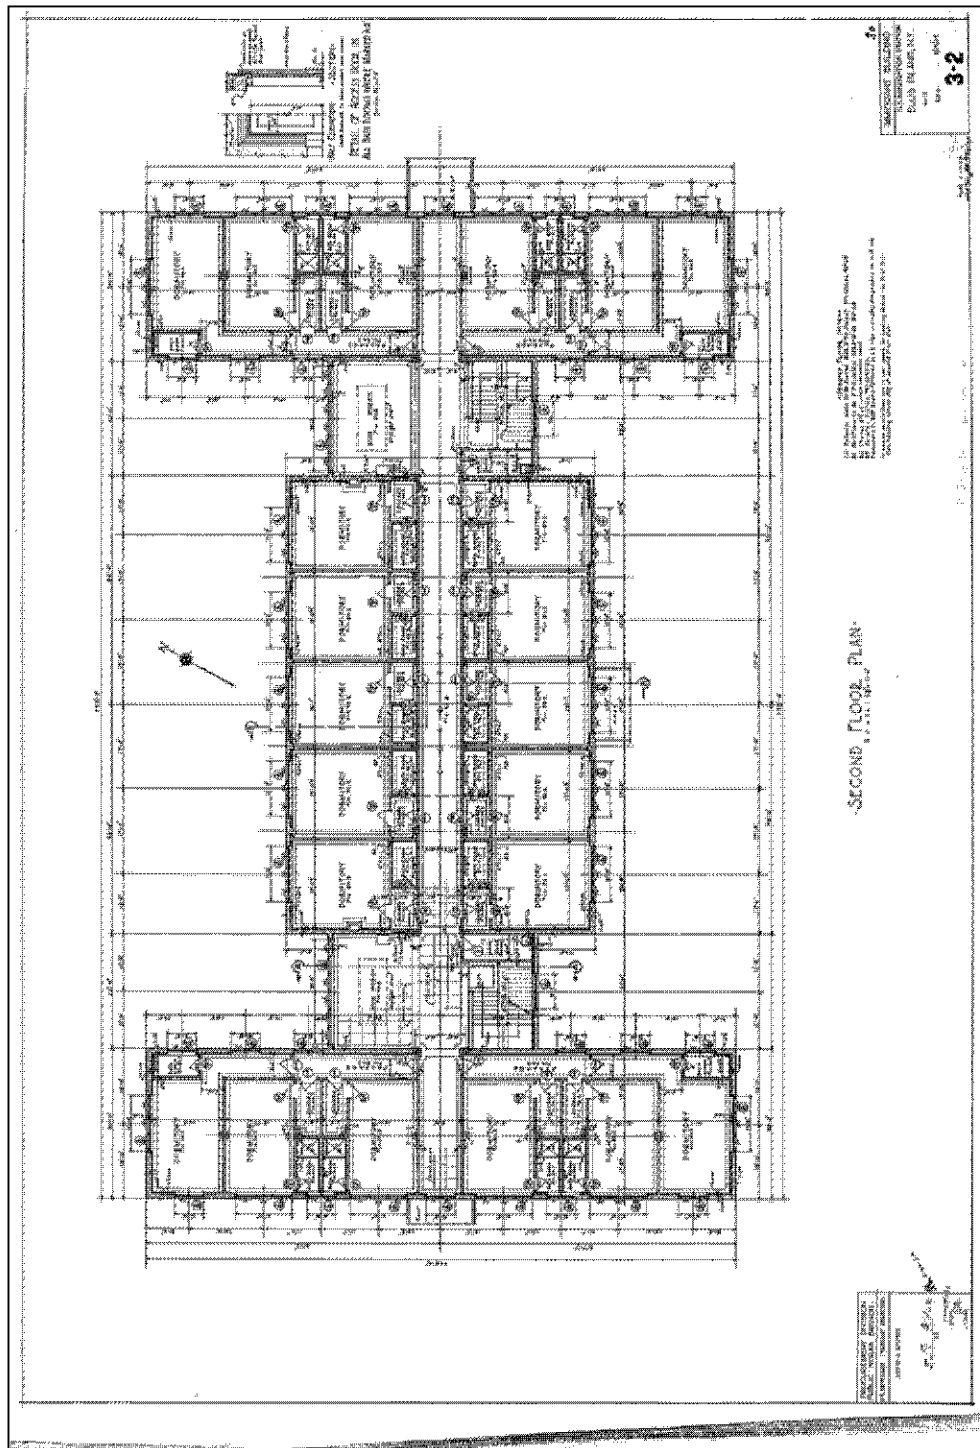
Second Floor Plan, New Immigrant Building, 15 February 1934
